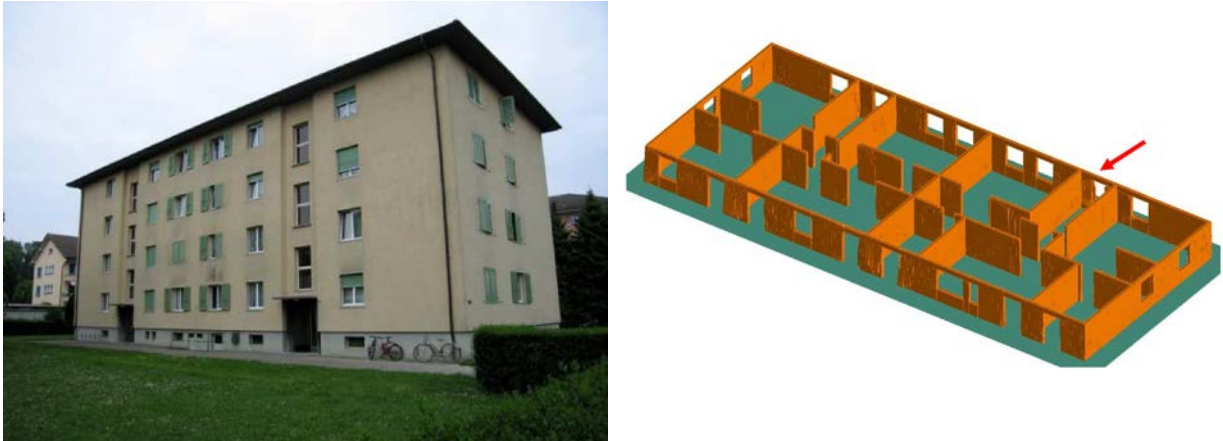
Benchmark YVR14, right: section view of the first floor [IMAC, 2014]
